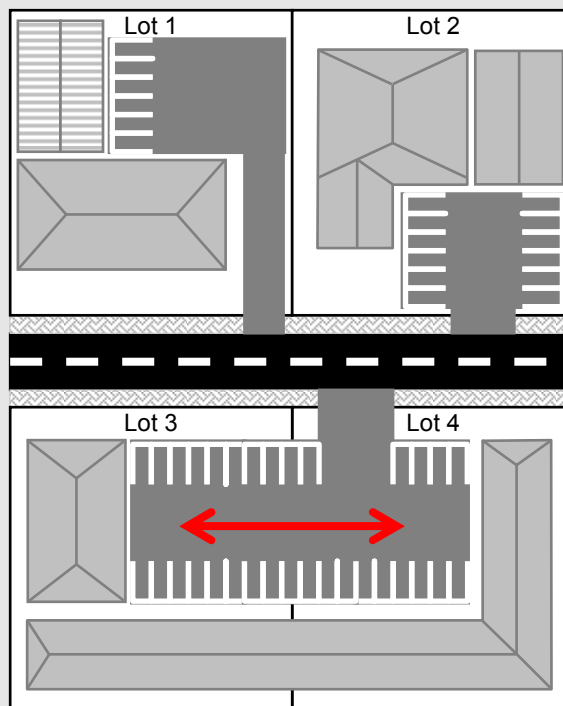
Example of where two premises (Lots 3 and 4) provide joint car parking facilities.
